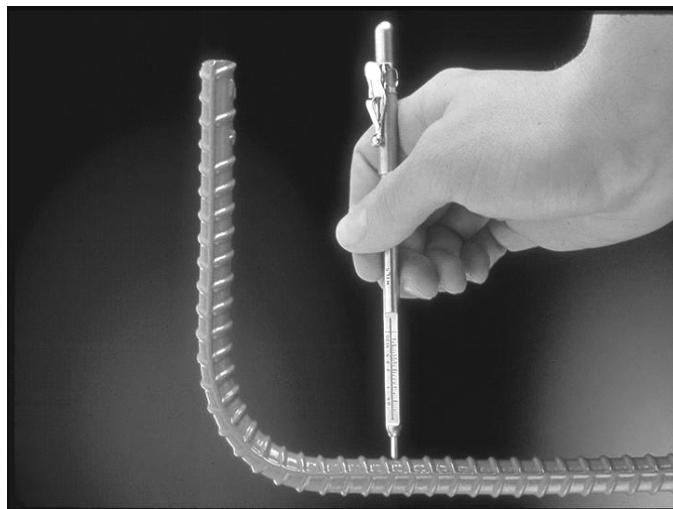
Pencil-Type Magnetic Pull-Off DFT Gauge
